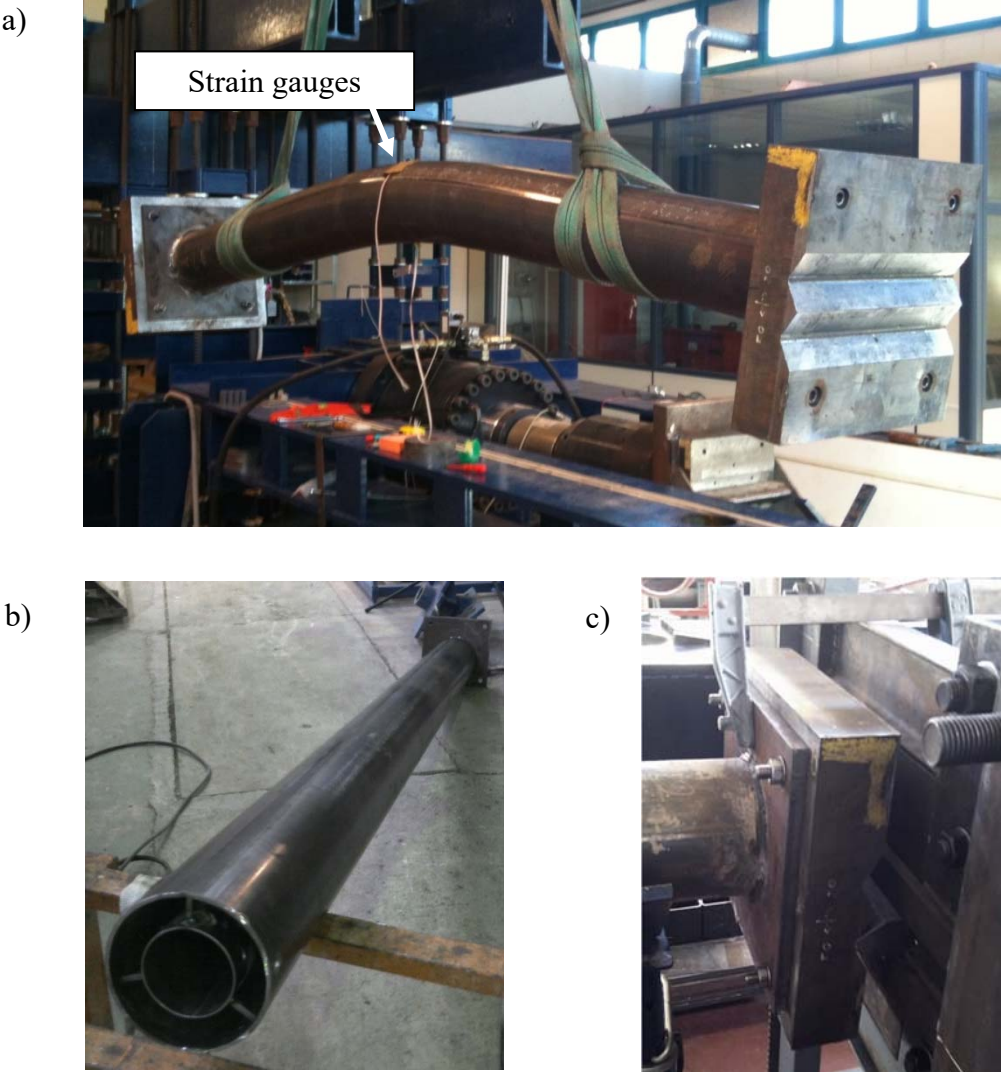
Room temperature tests: a) Column after test b) Cross-section detail c) Test set-up
